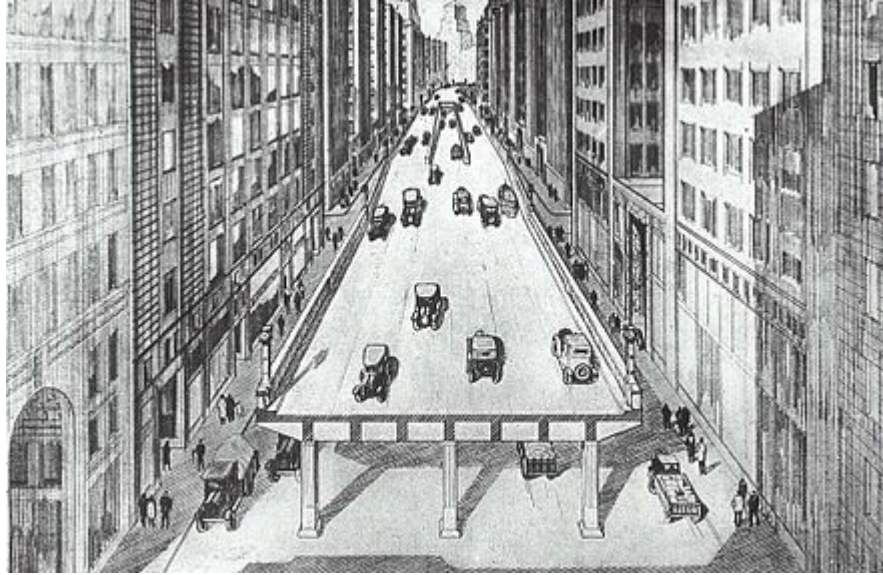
Aerial view of a 1930 proposal for Boston's Central Artery. This plan envisioned an even denser configuration than the Detroit plan, with highways raised directly above local streets like elevated railways. Robert Harvey Whitten, *Report on a Thoroughfare Plan for Boston* (Boston City Planning Board, 1930).
